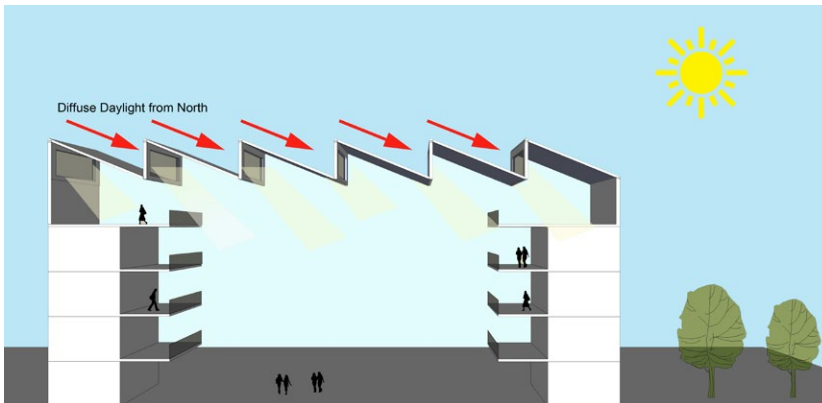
Example of design to block excessive direct sunlight and to allow defused daylight from skylight facing north
